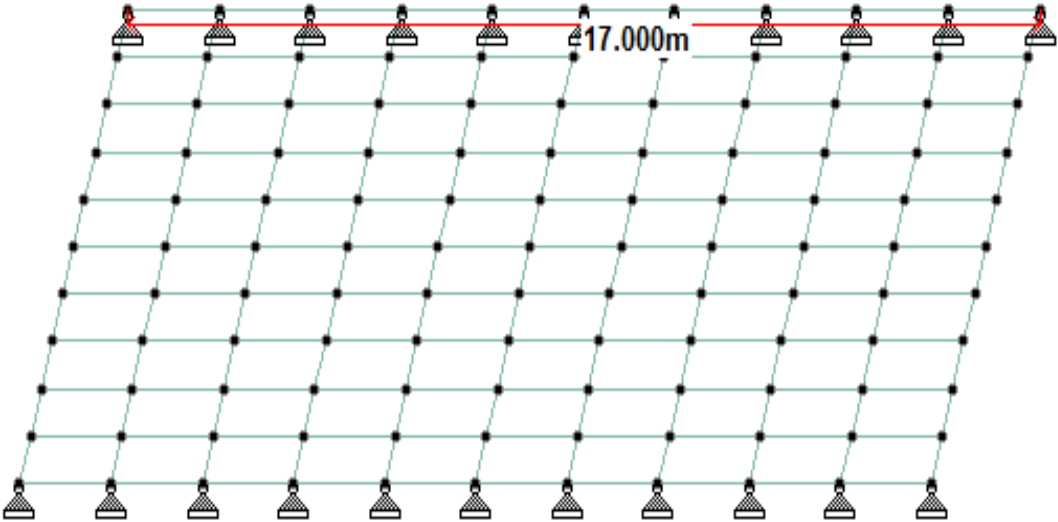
Plan view of slab with 17m span length at 15° skew angle
